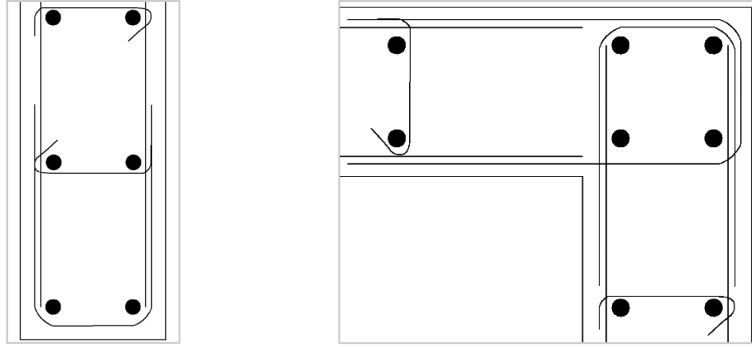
Flange edge detailing (left), Flange-Web corner detailing (right)
